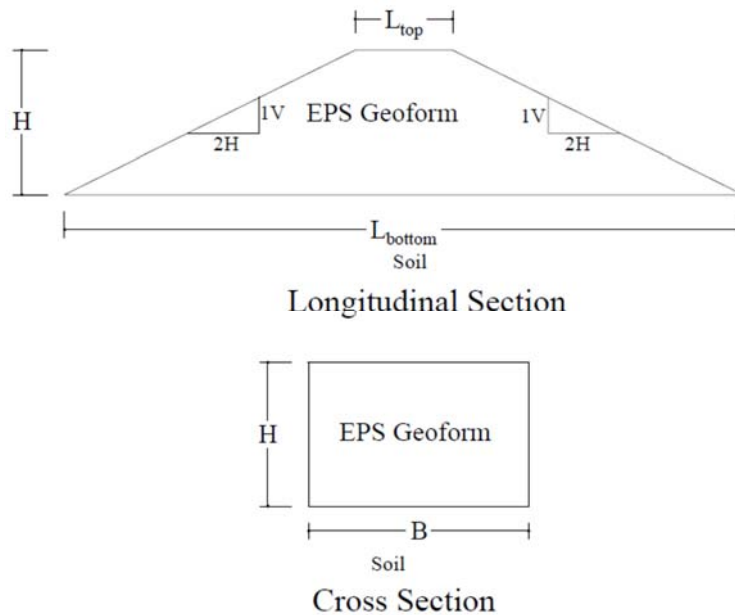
Longitudinal and cross section of trapezoidal prismatic shape EPS embankment
